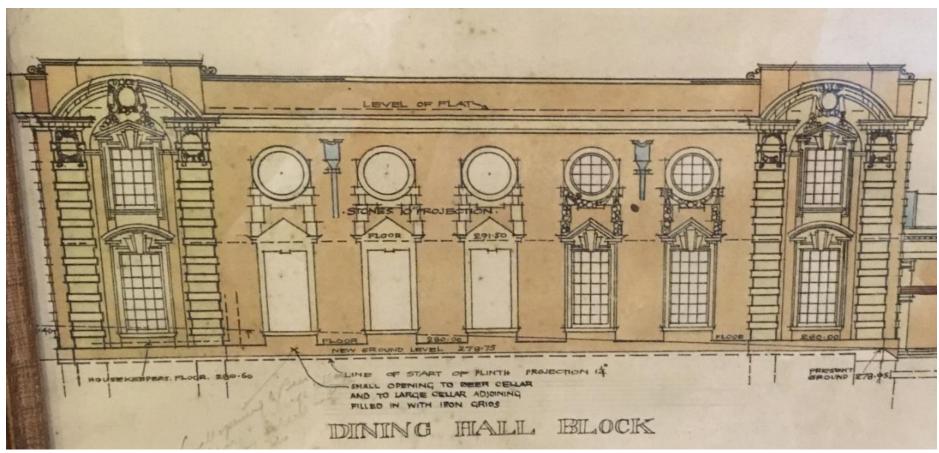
West Elevation of Dining Hall Block (North Block) – note east elevation is a mirror image
